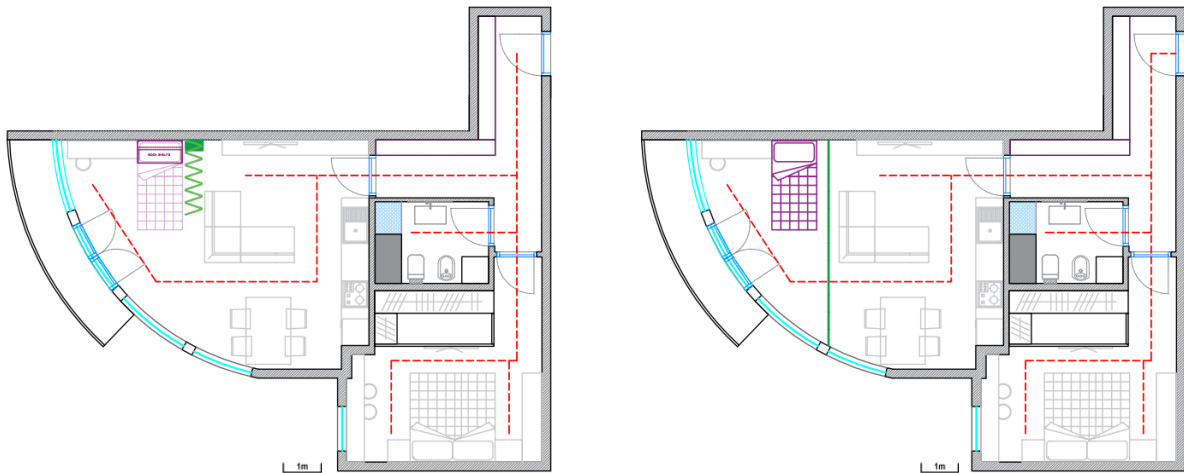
Diagram of the circulation of the new Apartment 1+1 second option Furniture Plan
